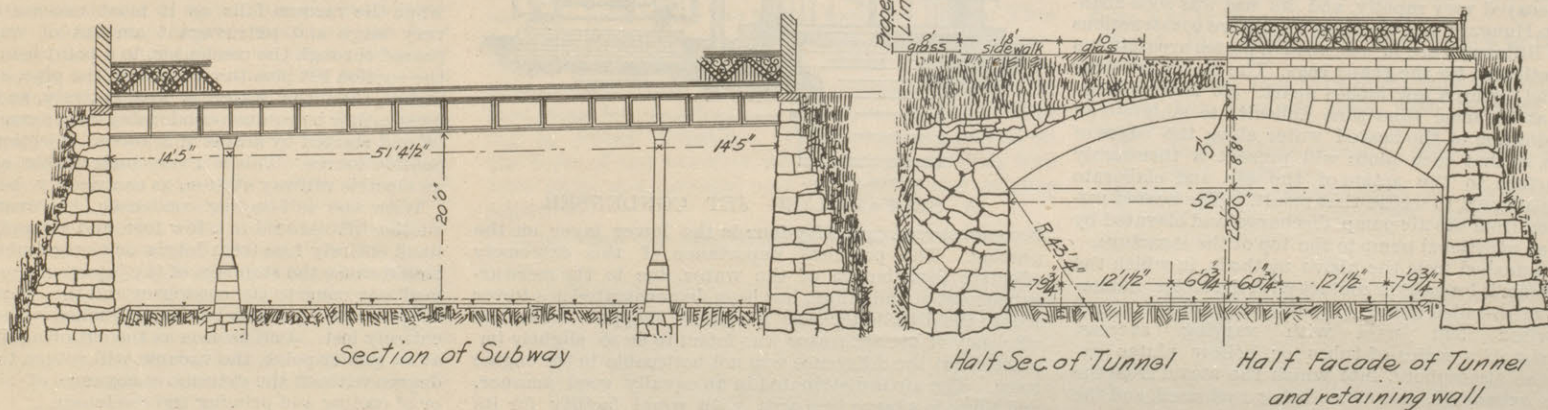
SECTIONS OF SUBWAY AND TUNNEL SHOWING PORTAL.
